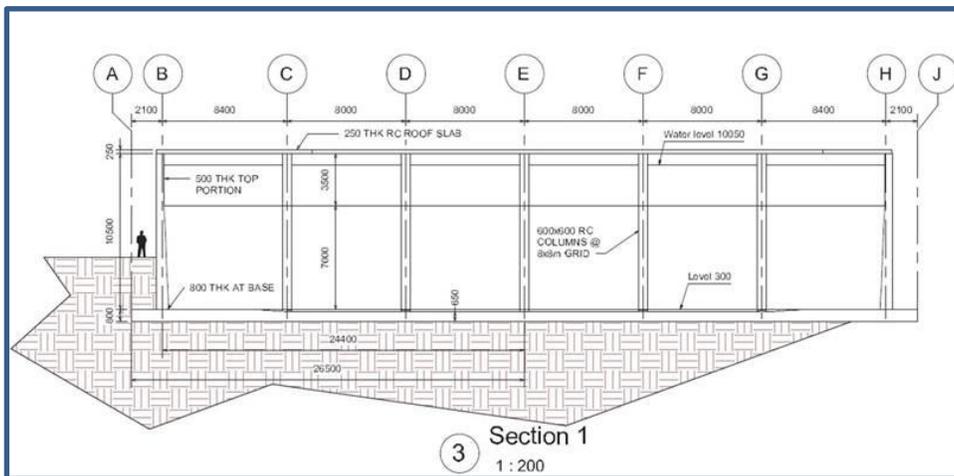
Detail showing sub-surface depth (~3.2 m) to which the proposed construction will extend (from SVA International).
